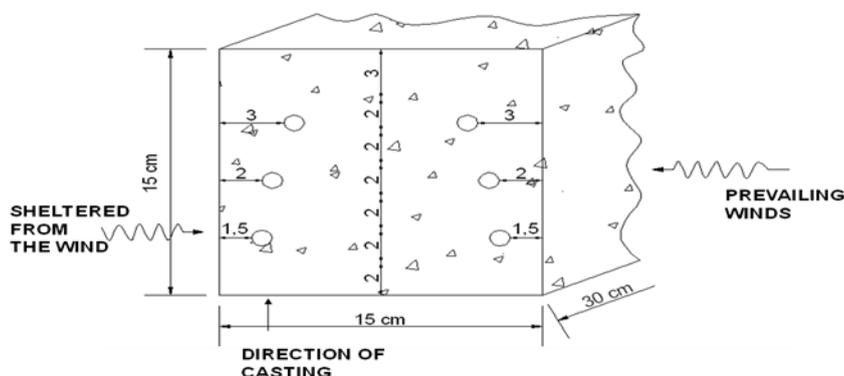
Schematic views of transversal and longitudinal sections of reinforced concrete structures used by the DURACON project.
